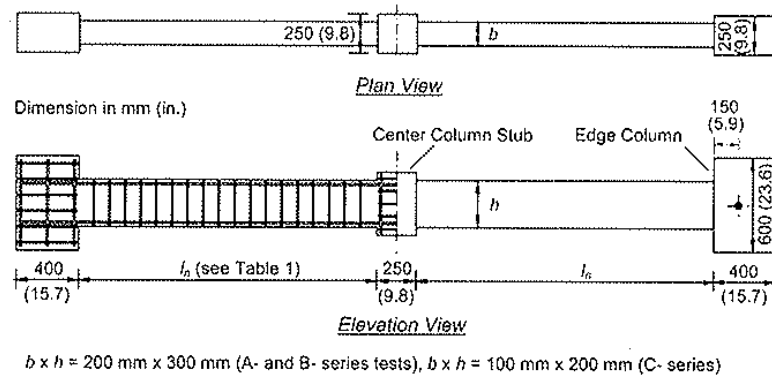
Test Sample Layout with Reinforcement Detail, Su et al. (2009)
